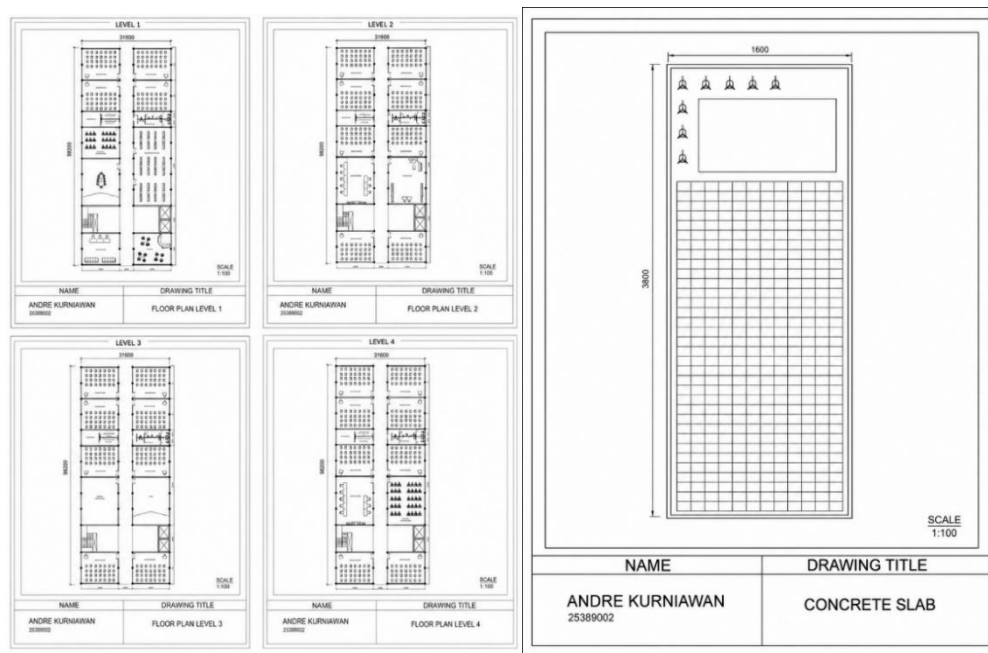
Floor Plans of Floors 1–4 of the Lecture Hall Building and Concrete Roof Deck
